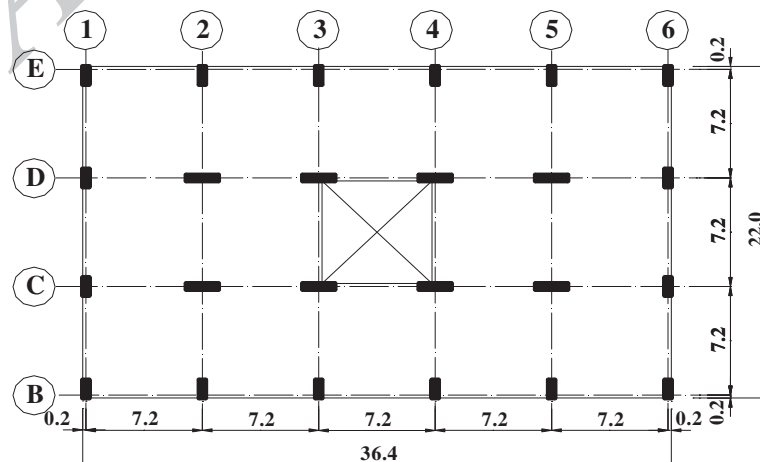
Plan of rectangular cross-sectional (RCS) flat-plate building (in meters).
